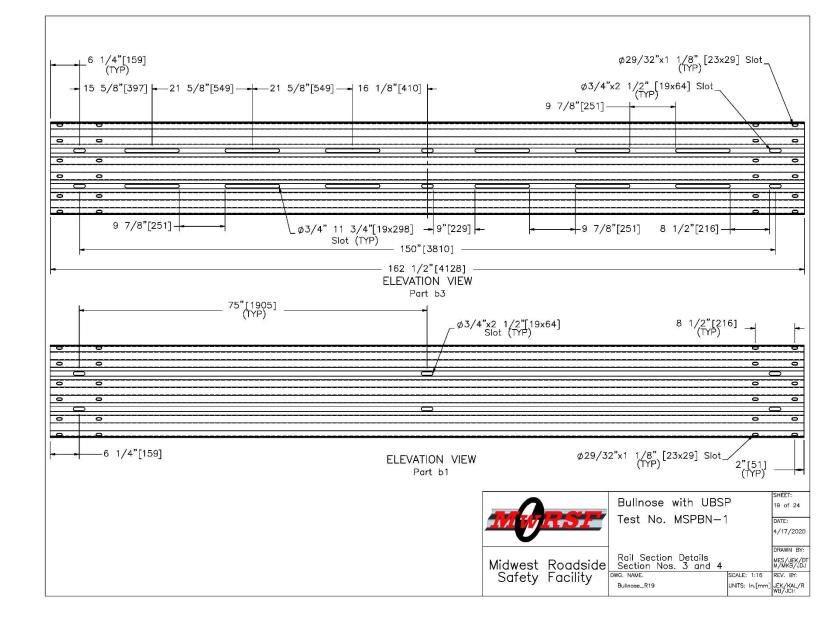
Rail Section Details Section Nos. 3 and 4, Test Nos. MSPBN-1 through MSPBN-3
